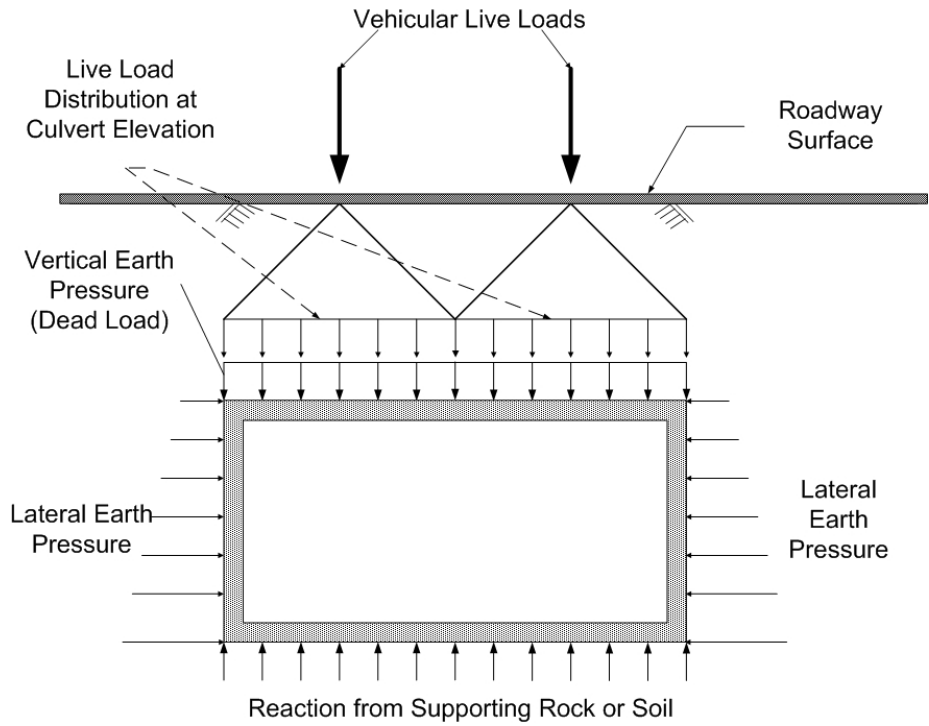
Loads on a Concrete and Timber Box Culvert
